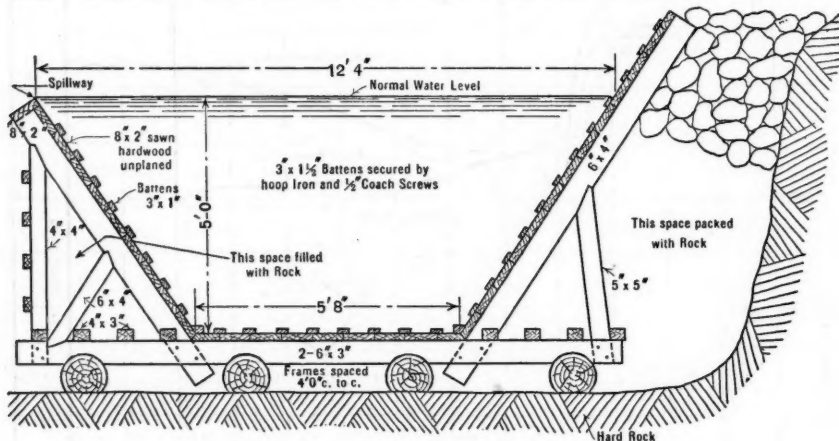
CROSS-SECTION OF TIMBER FLUME.
